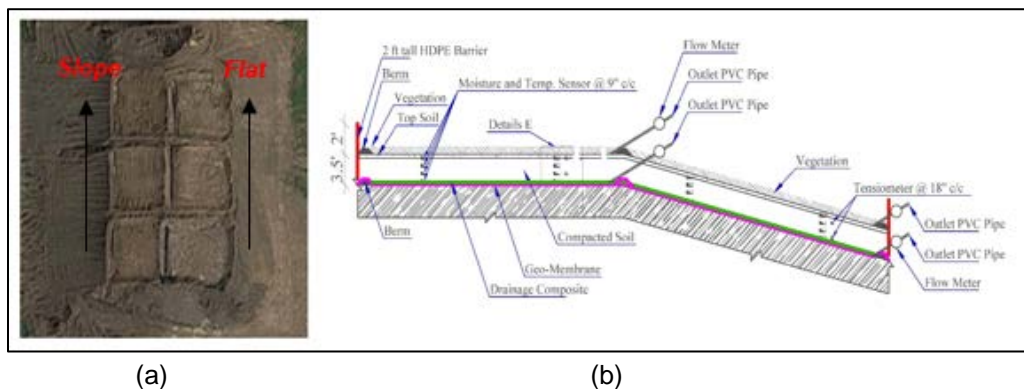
(a) Plan view of the lysimeters (b) section schematic
